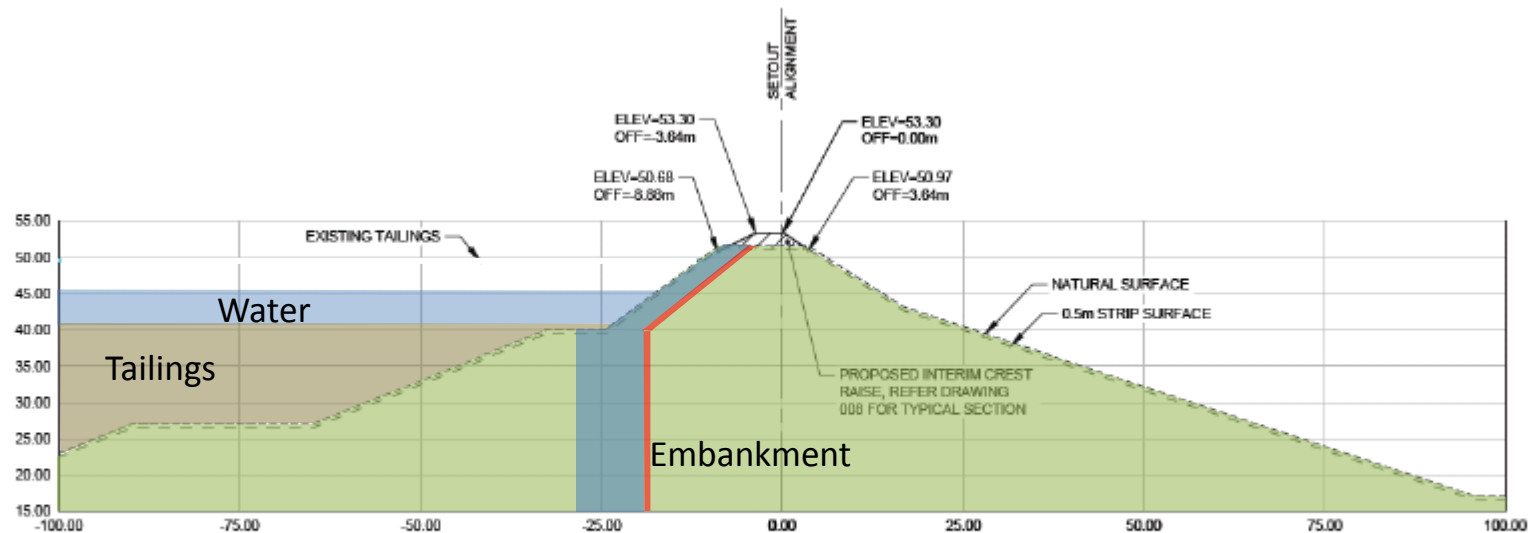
Cross section of current crest raise. (Golders, 2013)
